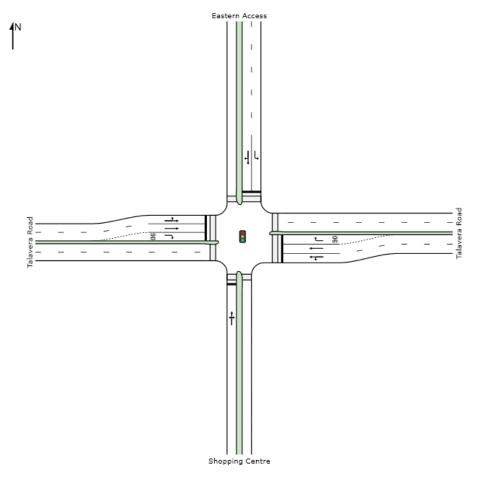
Layout of proposed Eastern Access / Talavera Road/ Shopping Centre Intersection
